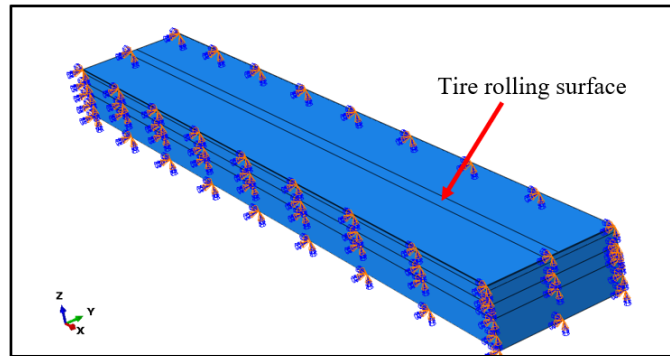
Haul road showing fixed boundary conditions at sides and bottom
